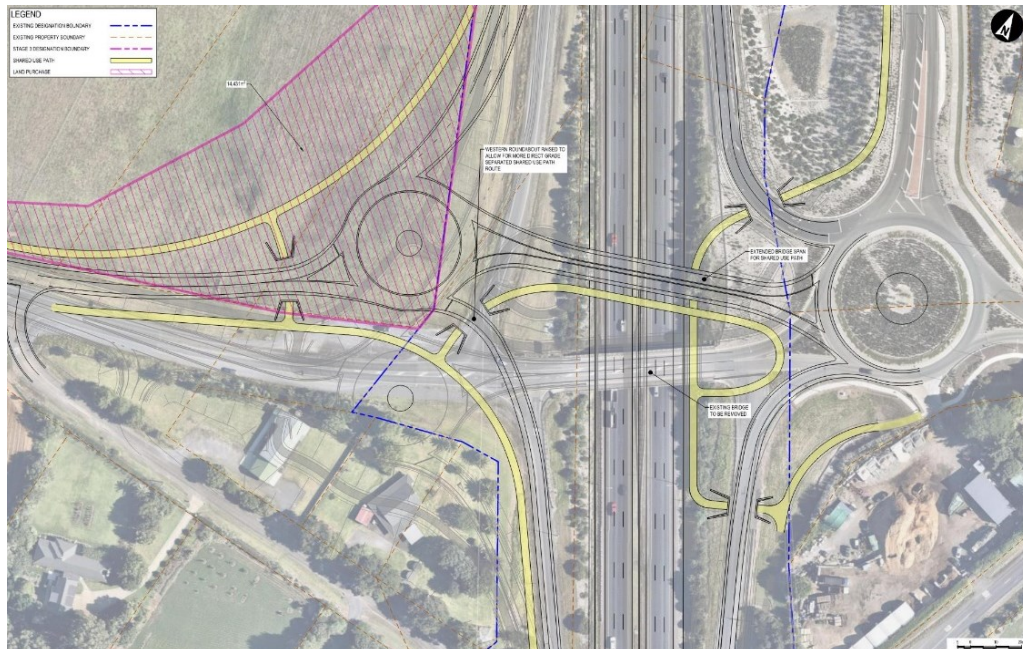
Ramarama Interchange: Option Two General Arrangement Plan
